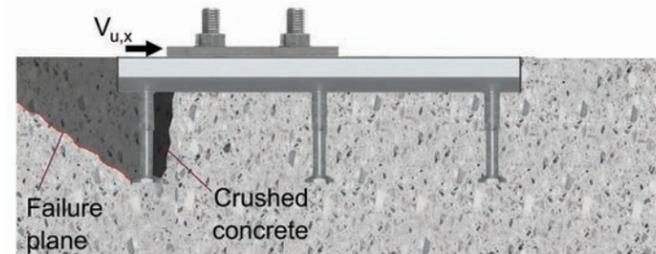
Load-bearing mechanism of headed stud anchorage subjected to shear loading (schematic).
